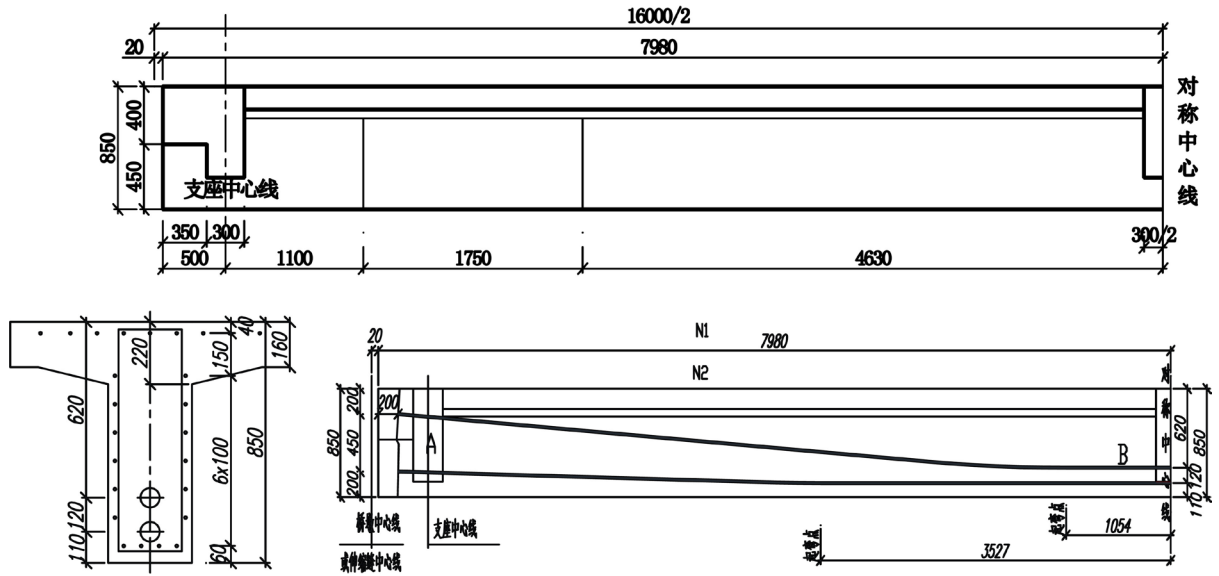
Test beam half elevation and detail size and steel bundle layout (unit: mm)
